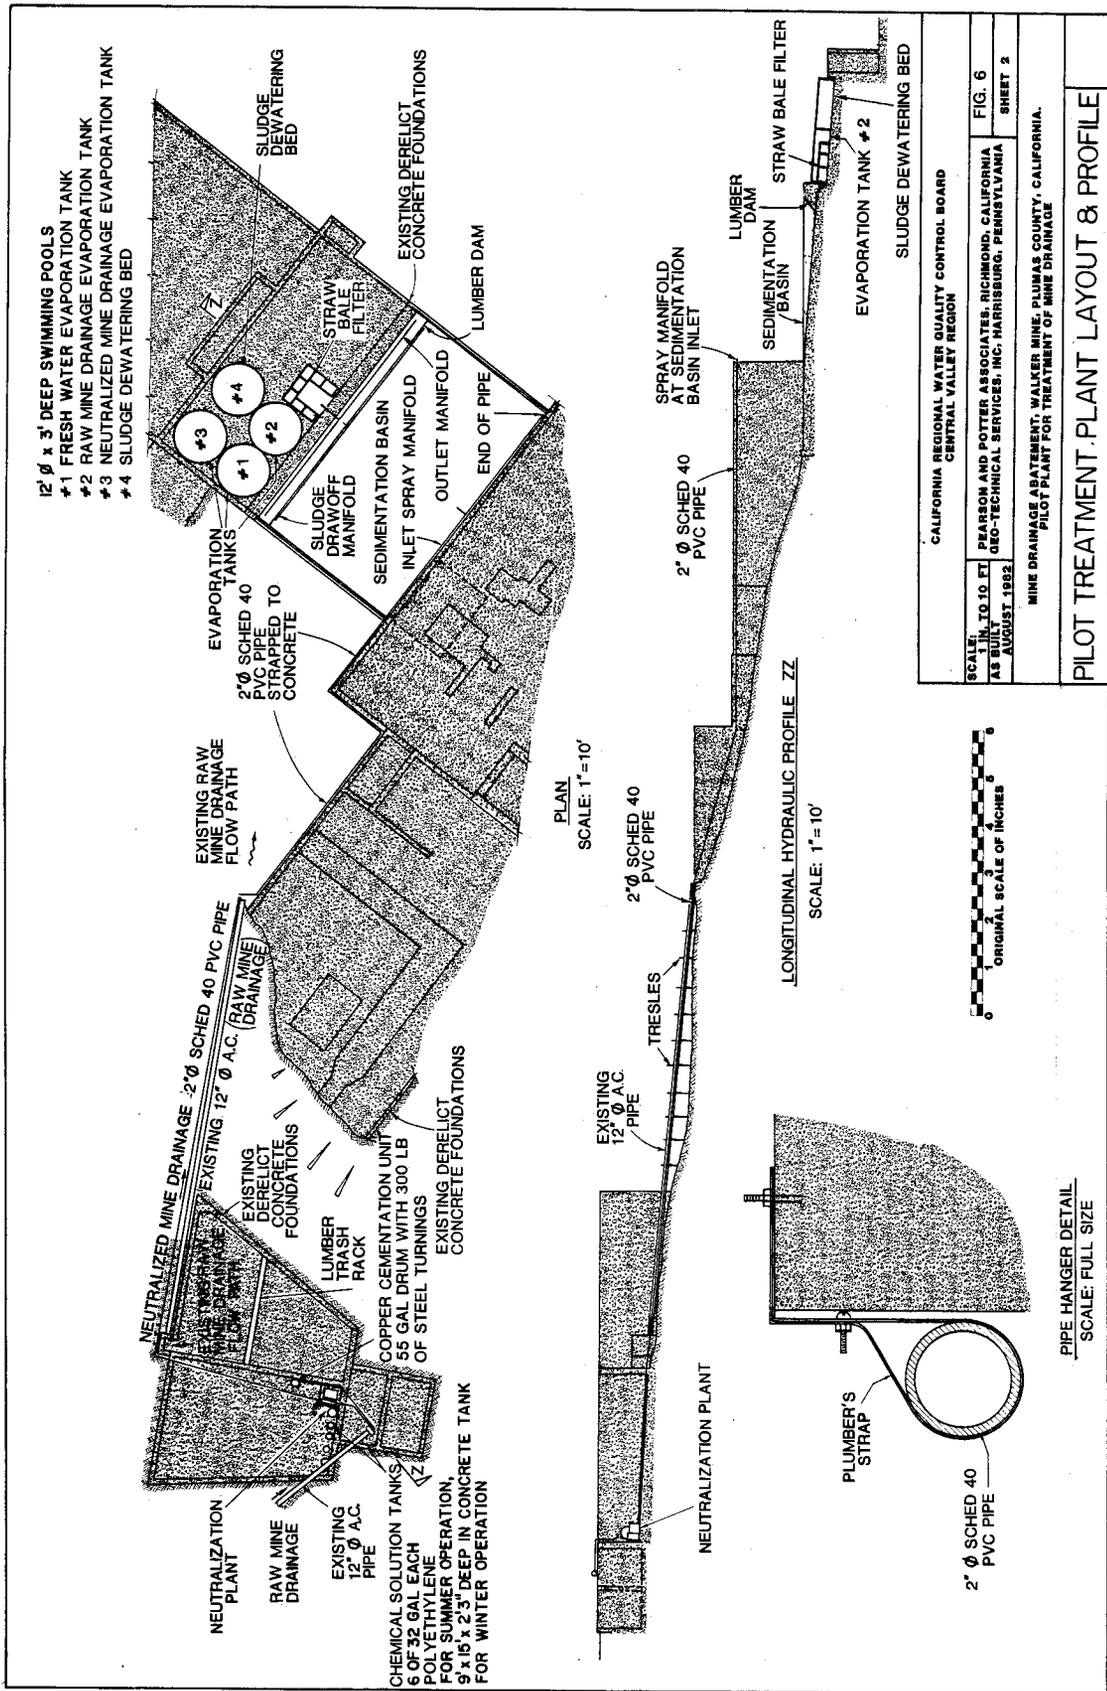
Pilot Treatment Plant Layout and Profile (As-Built Construction Drawing Reduced to 25% Size).
